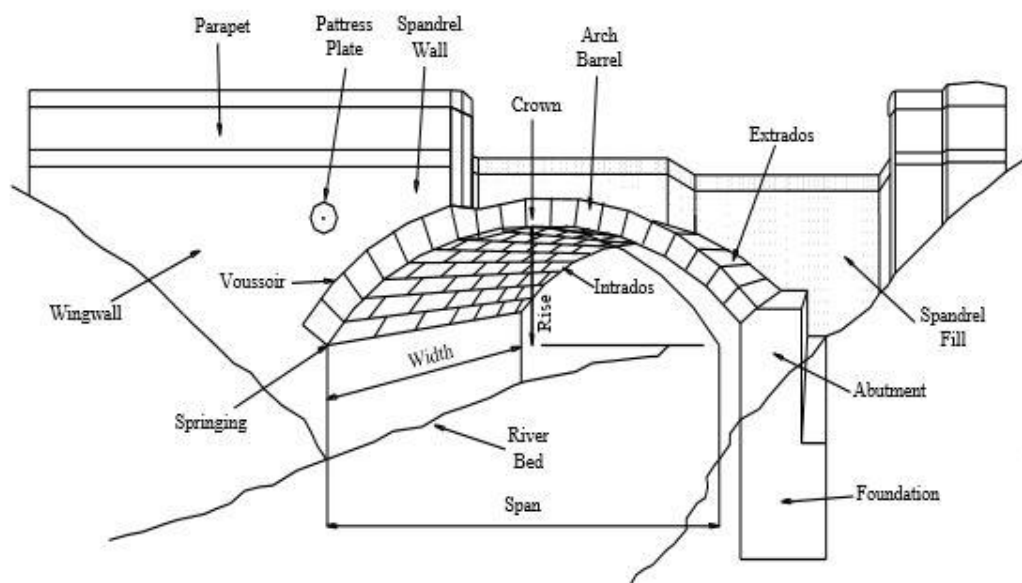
main elements of masonry arch bridge (Mckibbins, L. 2006).
